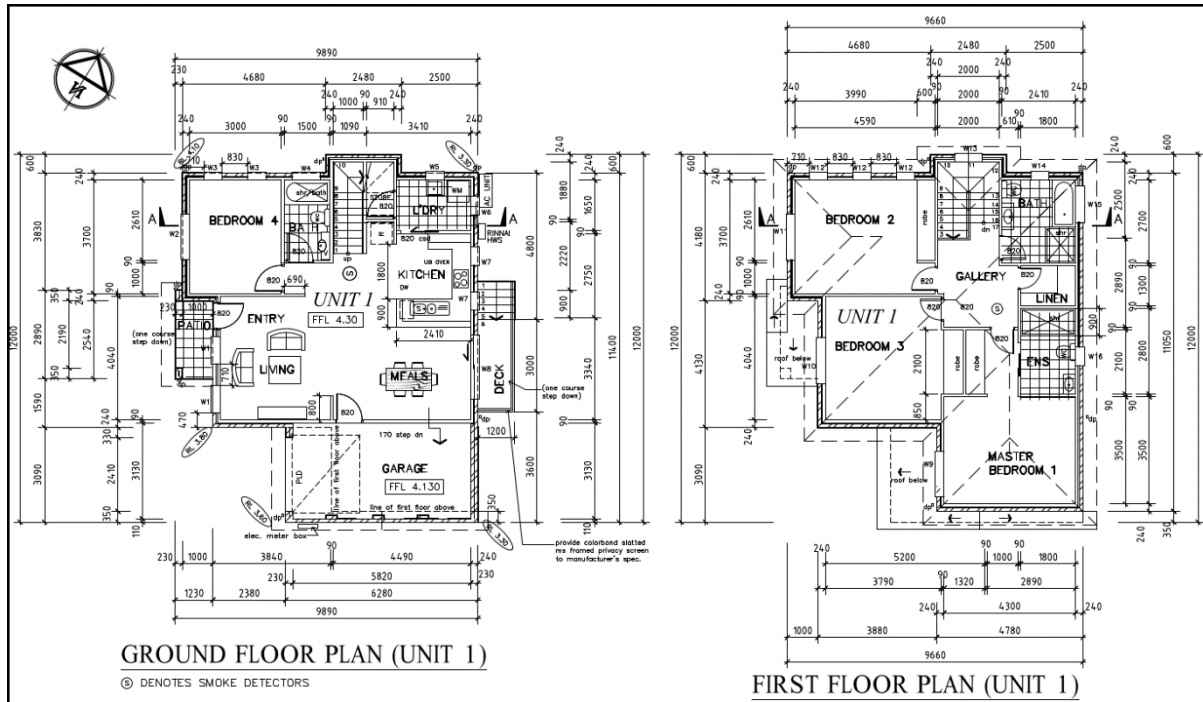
Approved Unit 1 floor plans - DA 2013/193/2
